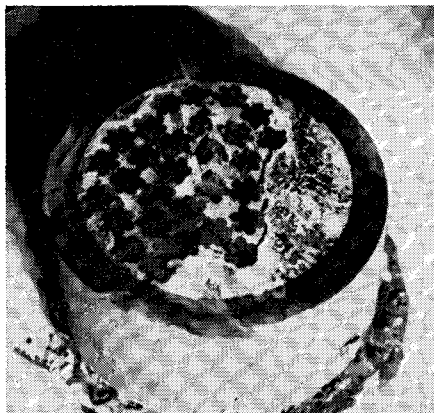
Cross-section of 28-strand grouted tendon on 20-ft. (6 m) radius
